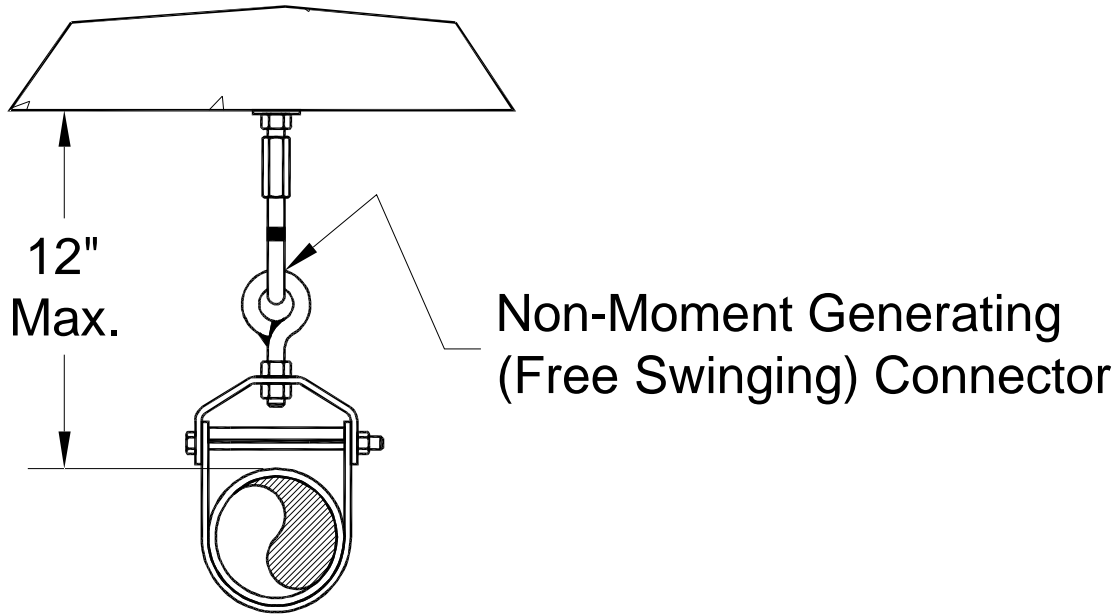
; Measurement of 12" Dimension for Single Clevis Supported Pipe
